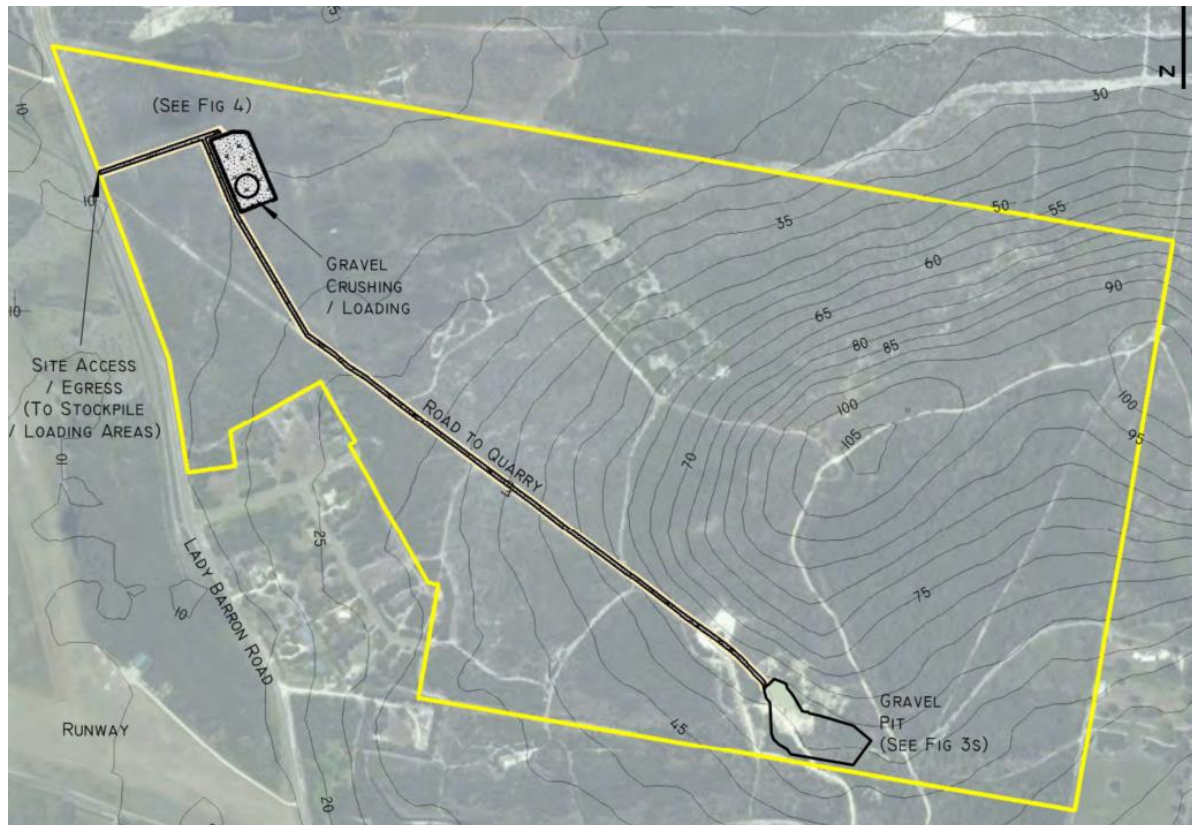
Site elevation from development application supporting information Figure 2 (page 14).
